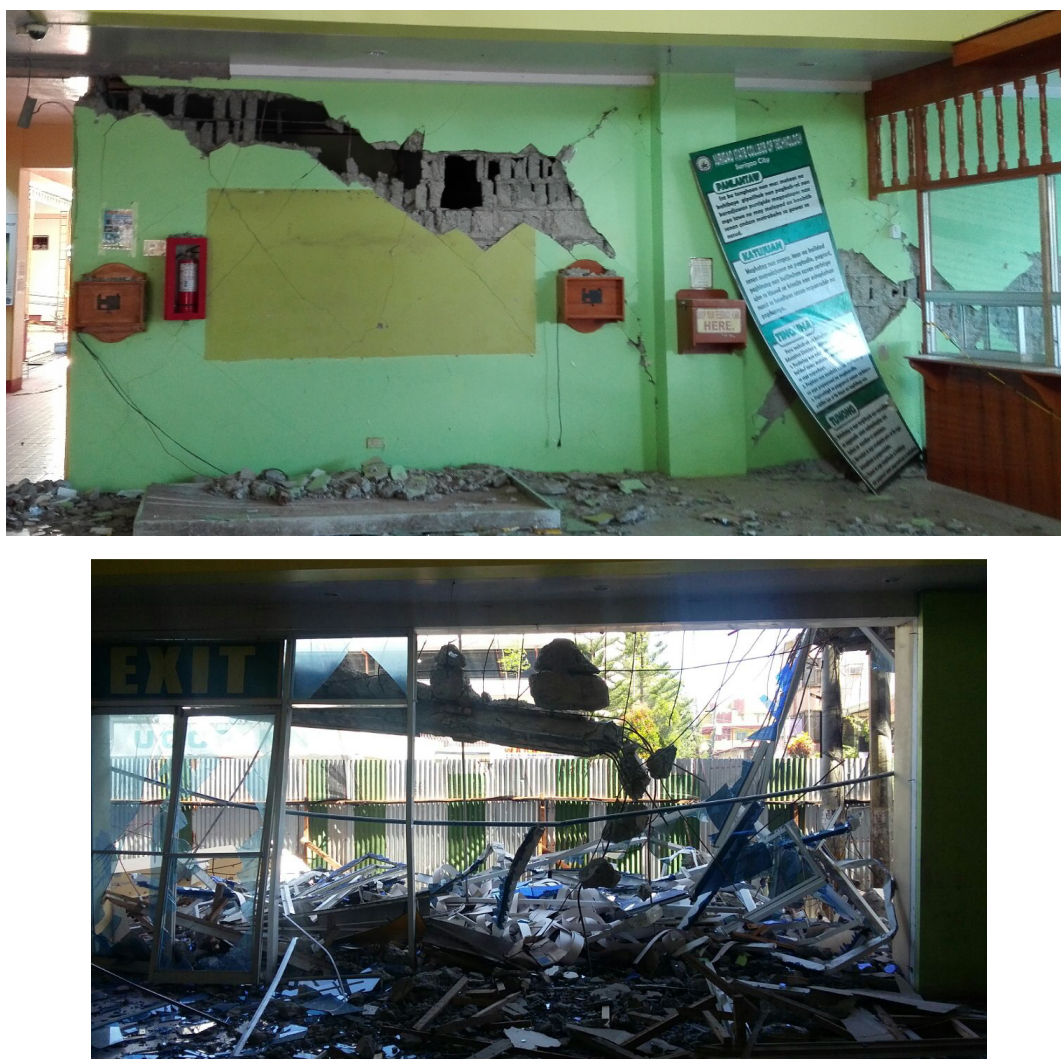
Masonry infill wall cracking (above) and entry structure destroyed by collapsed parapet wall (below). Main structure remained undamaged, but nonstructural components could be life threatening.
